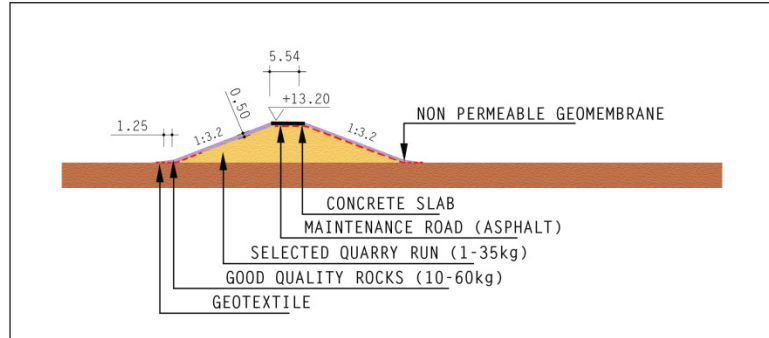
Completed Cross Section for North Dam (van de Enden, 2014)
